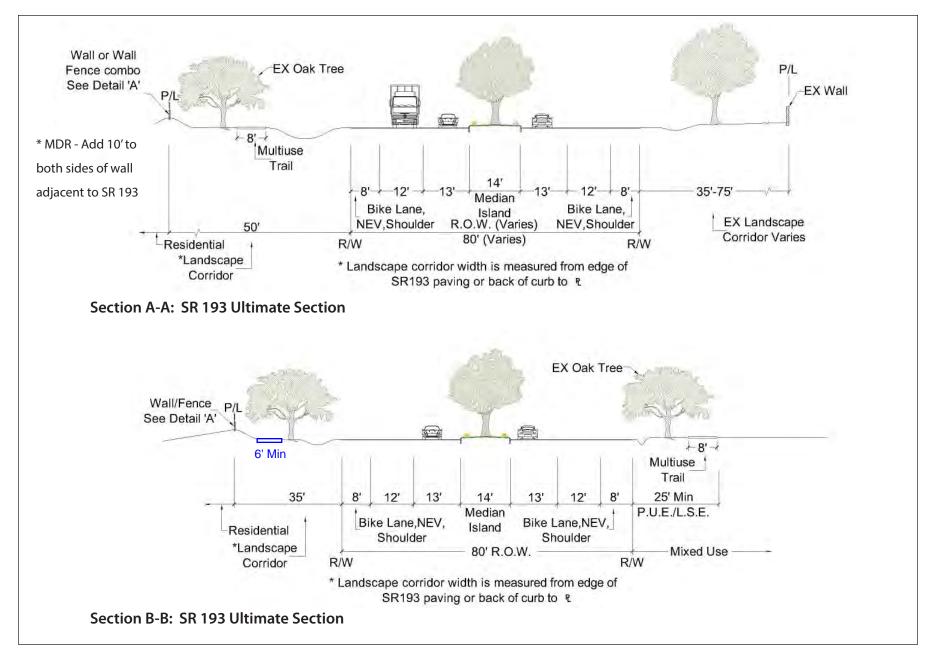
Major Arterial Street Cross Sections - SR 193
